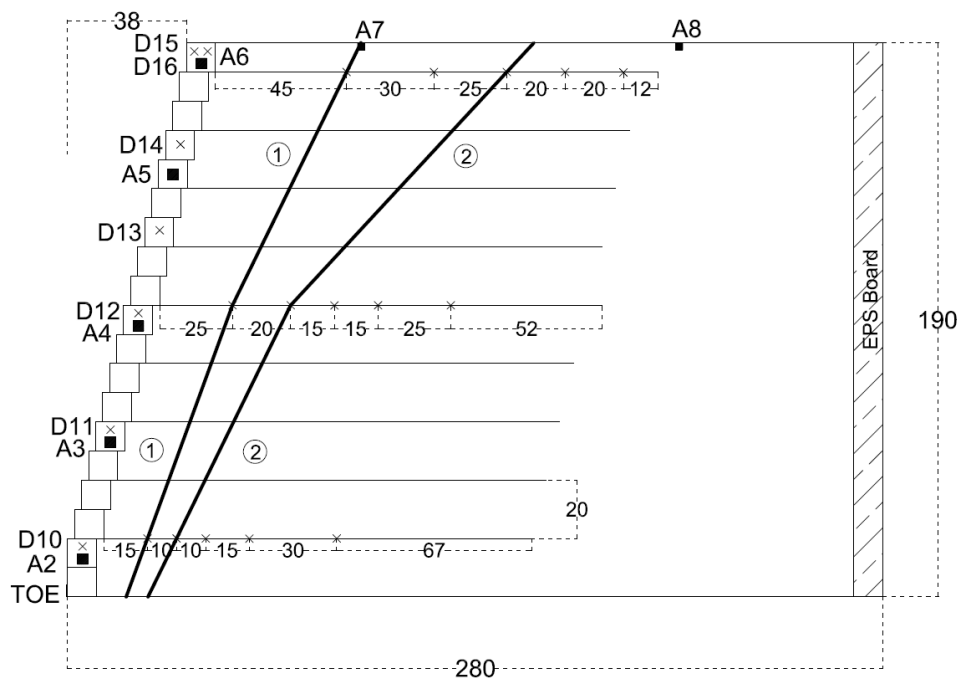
Potential Failure Planes for Setup 1 Kobe 75%.
